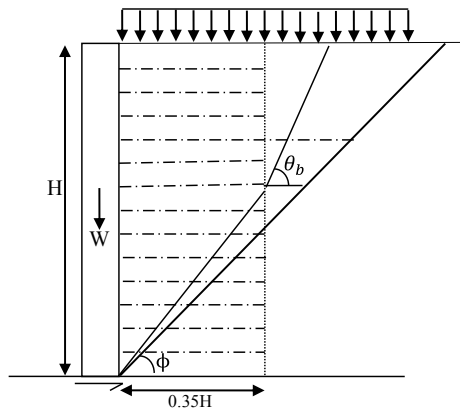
GRS—RW with full height facing after staged construction. *Source* RTRI [5]
